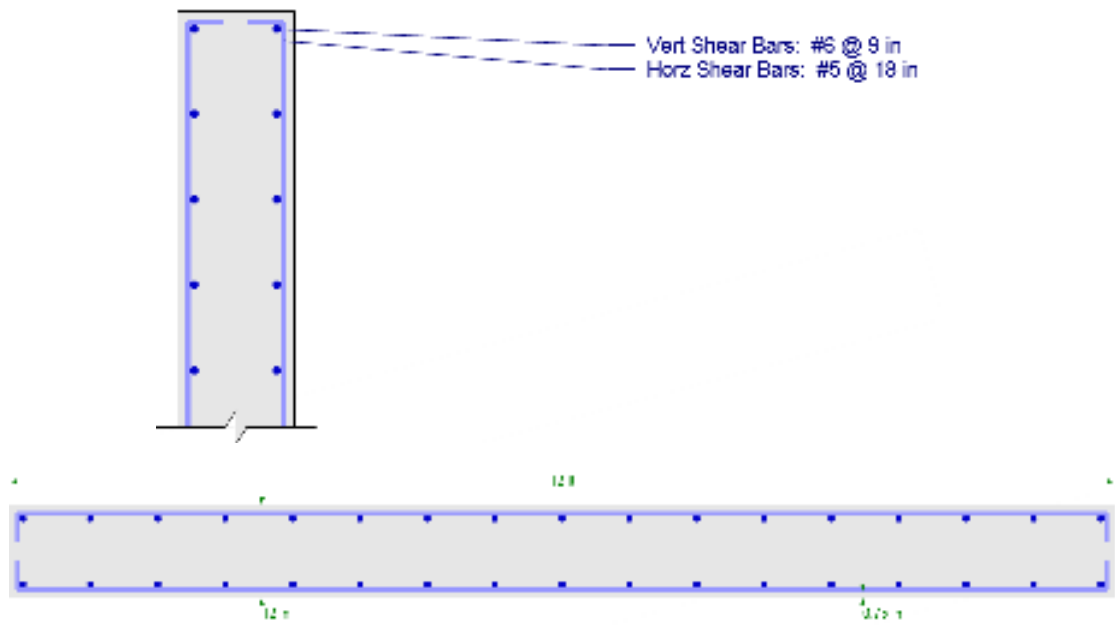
Building (B8-9S-L-O) Ordinary RC Shear Reinforcement Details; Wall Section for Floors 1-3
